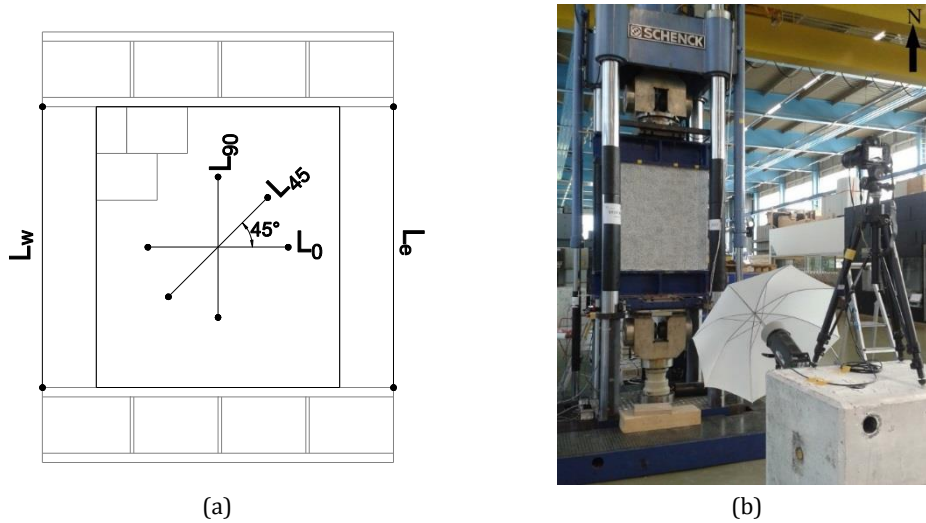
Compression tests on wallettes with inclined bed joints: (a) Instrumentation plan; (b) DIC measurement system
